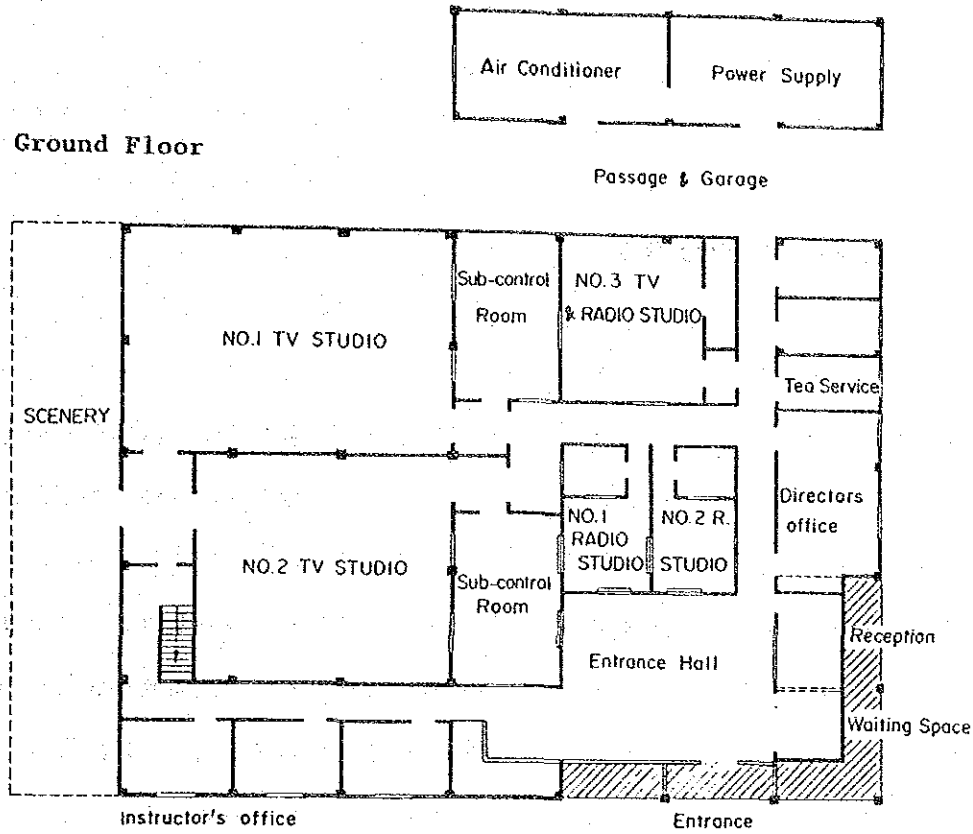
1 FLOOR LAYOUT OF TRAINING INSTITUTE
